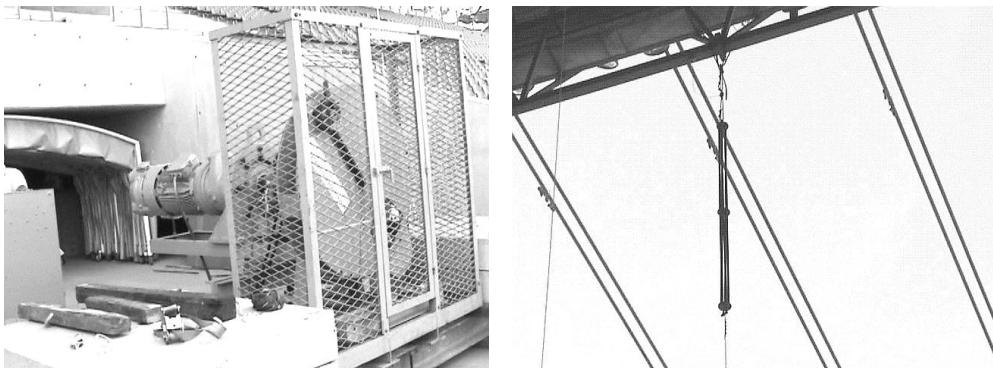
View of the electric engine with the eccentric link (a) and of the girder linked spring (b).
